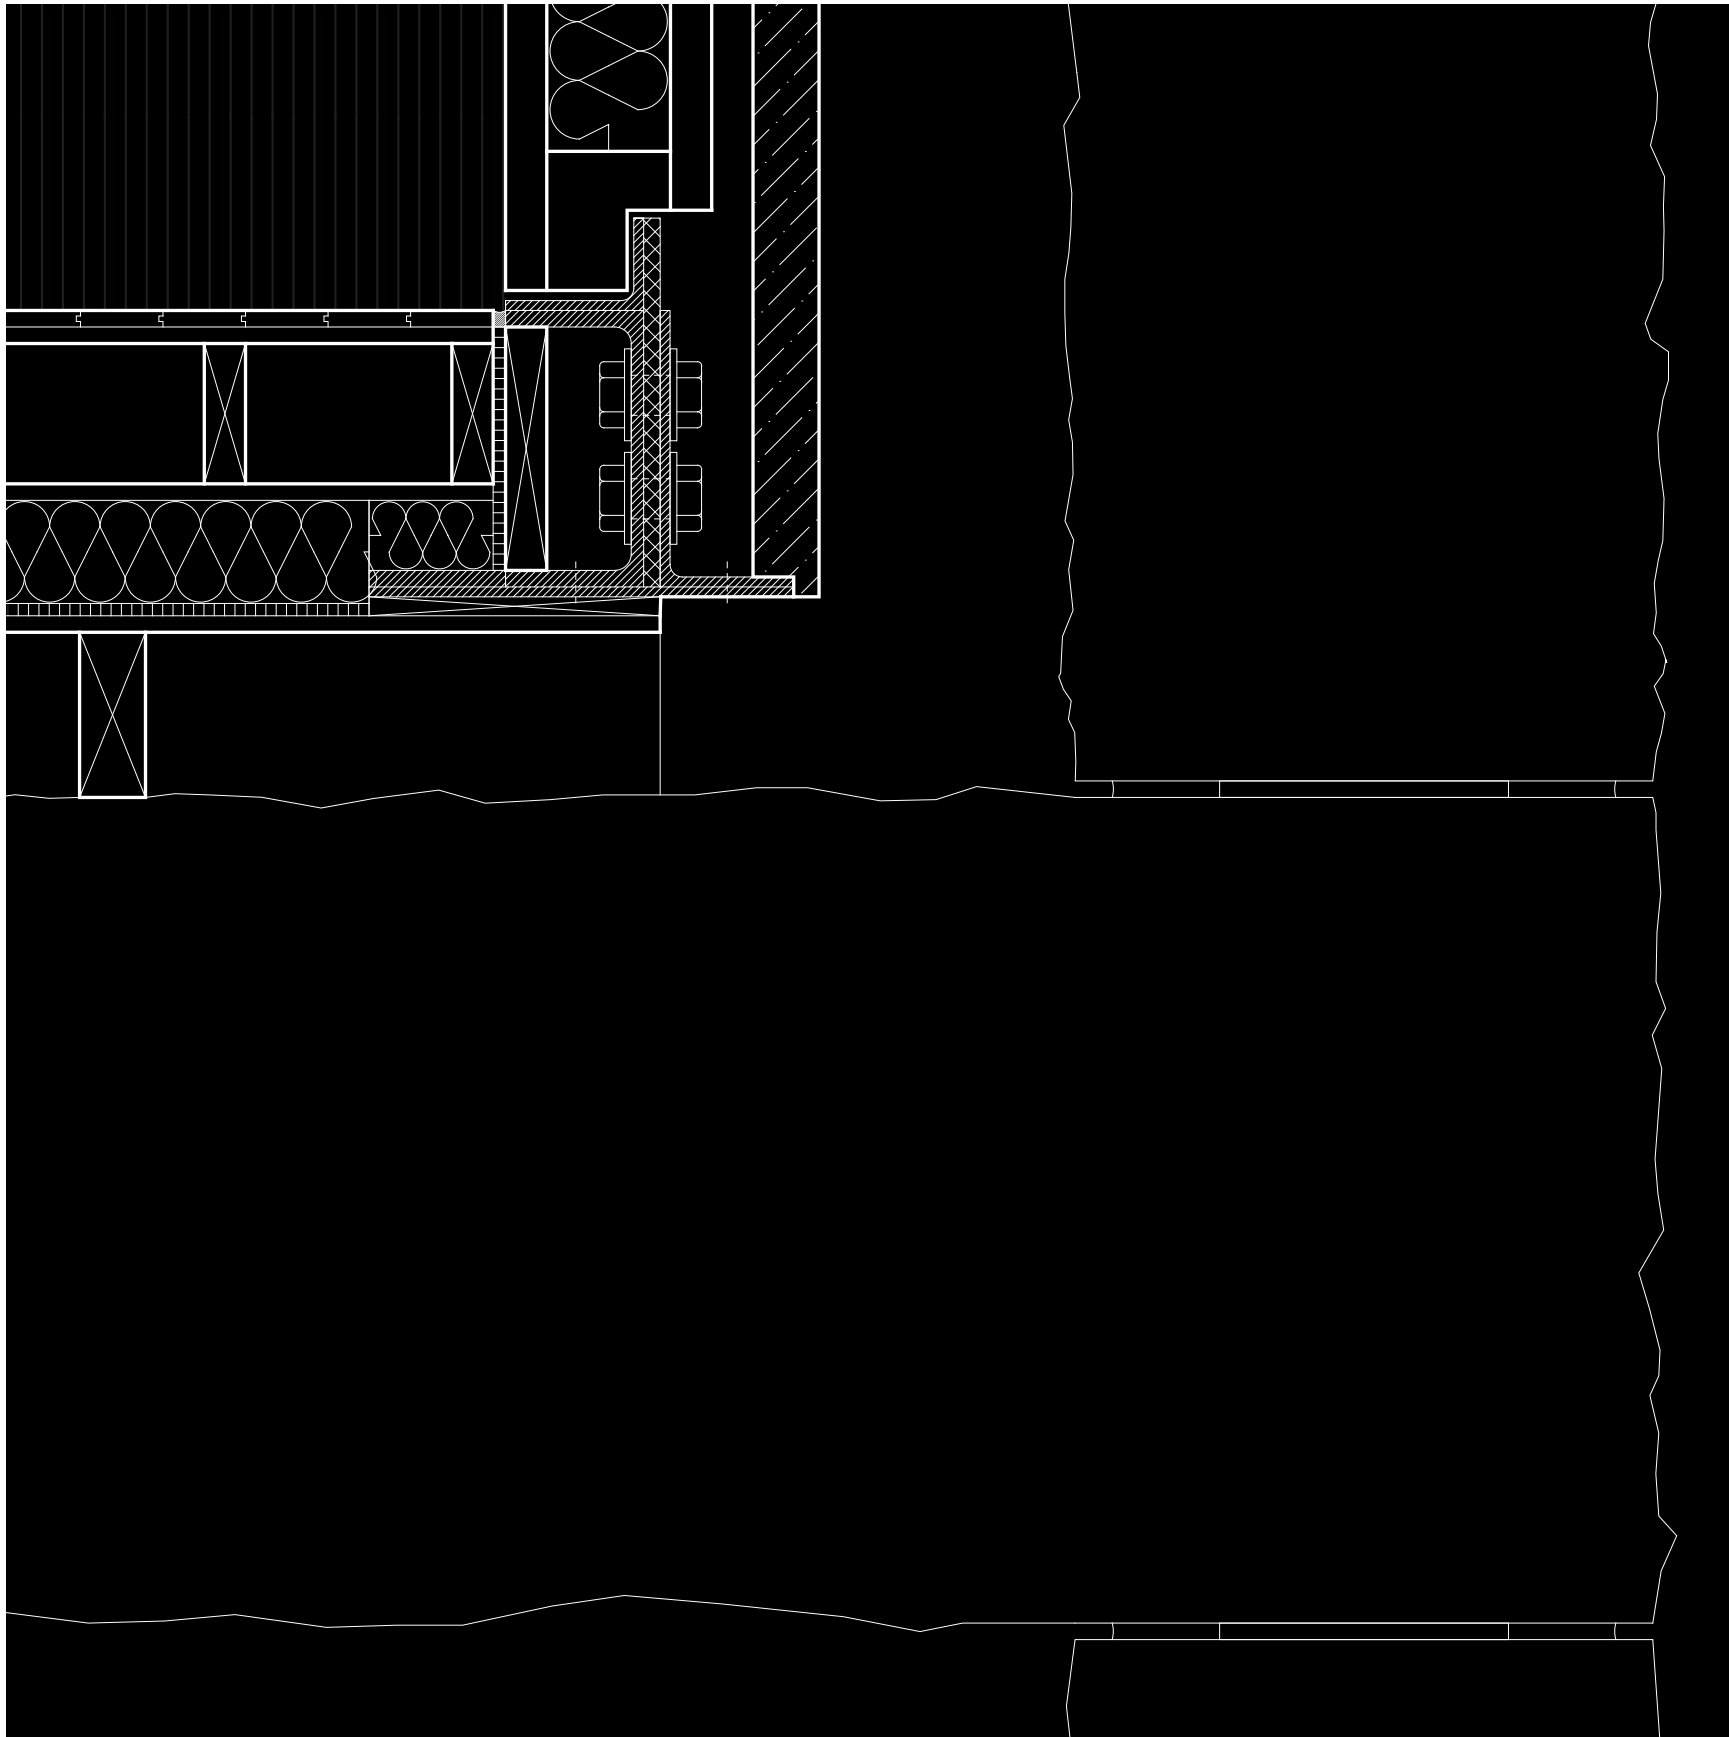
Detail Drawing Highlighting the Wall & Floor Construction of the Accommodation and the Durable Facade.
